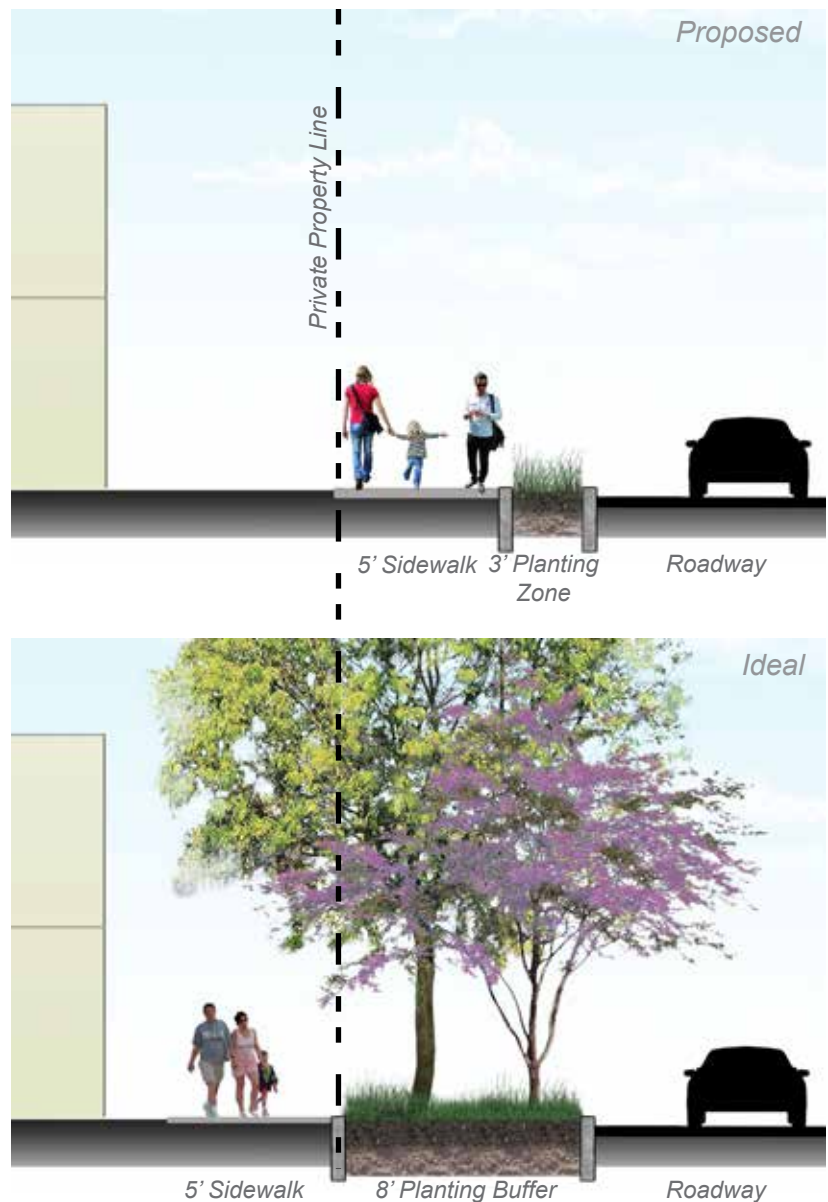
Proposed Cypress Creek Parkway Pedestrian ROW Sections
